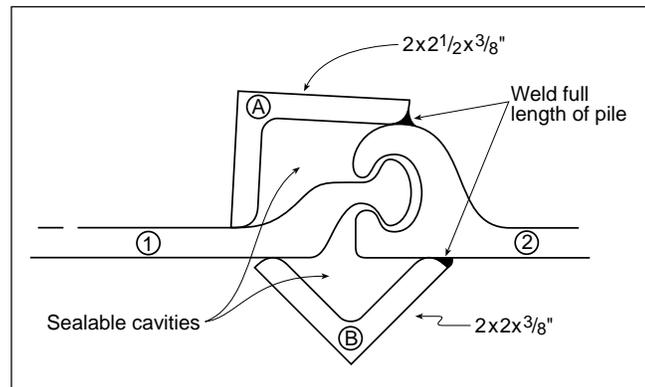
Steel angle section welded to sheet pile interlock
